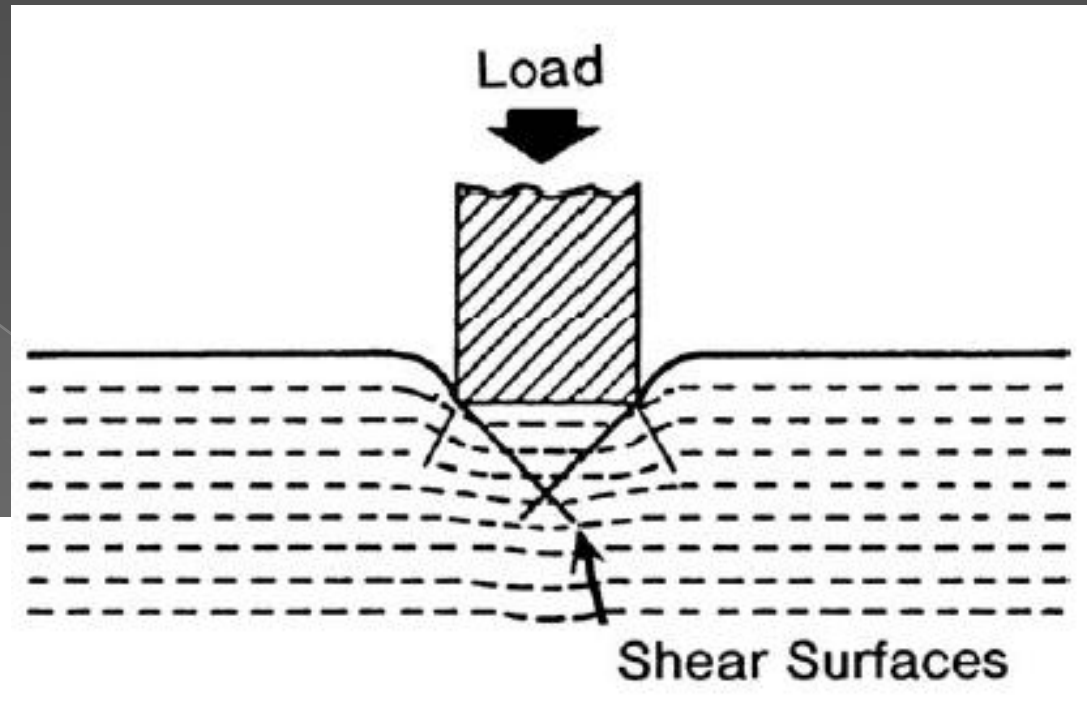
Punching shear foundation failure. (After Vesic, 1963.)
